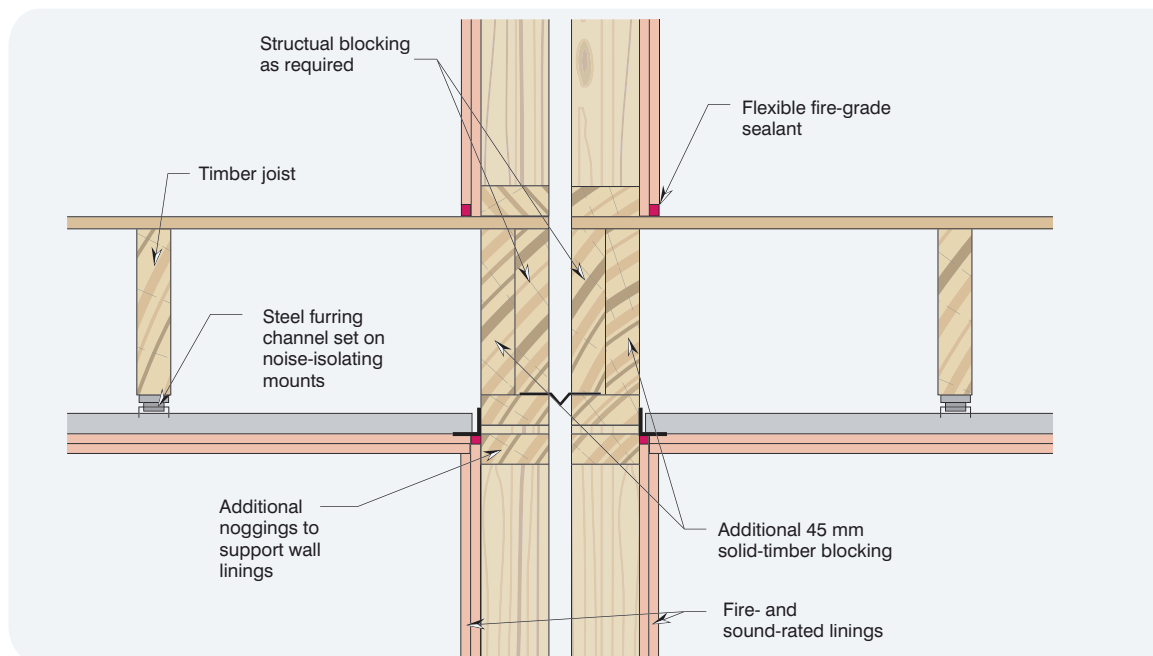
Typical junction of elements with the same FRL – fire-rated floors abutting fire-rated walls – elevation view.
